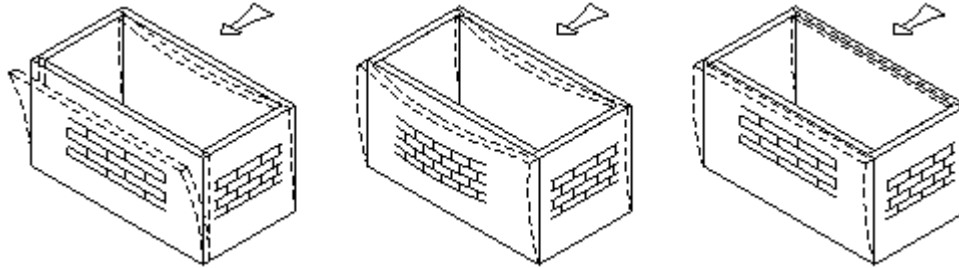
Behavior of the wall box: "a" non-clamped walls, "b" clamped walls with deformable floors, "c" clamped walls with rigid floors
